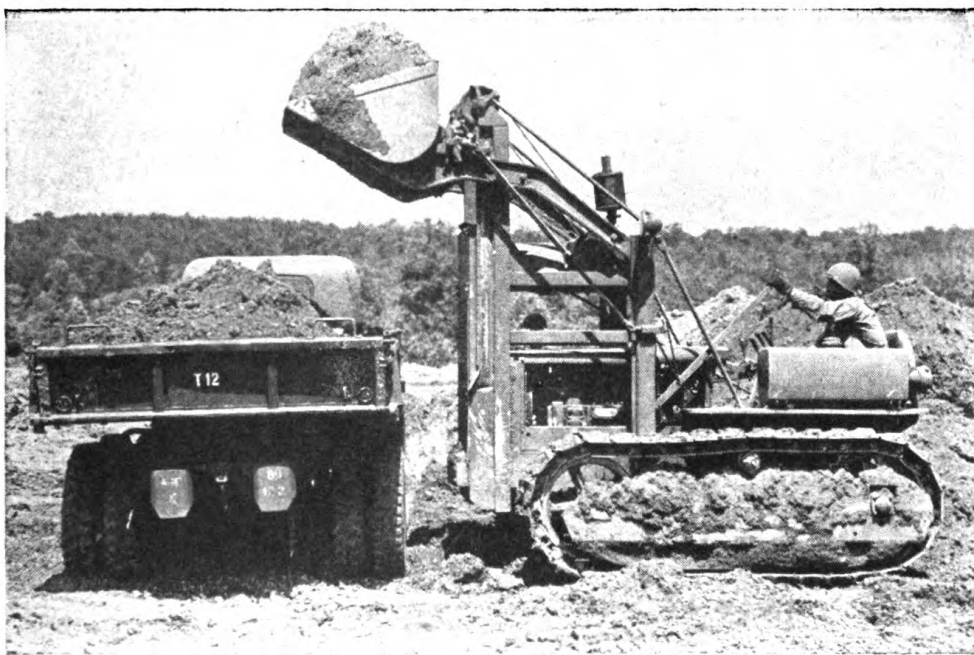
Tractor-mounted 1-cubic-yard bucket loader loading truck with light soil from confined excavation.
